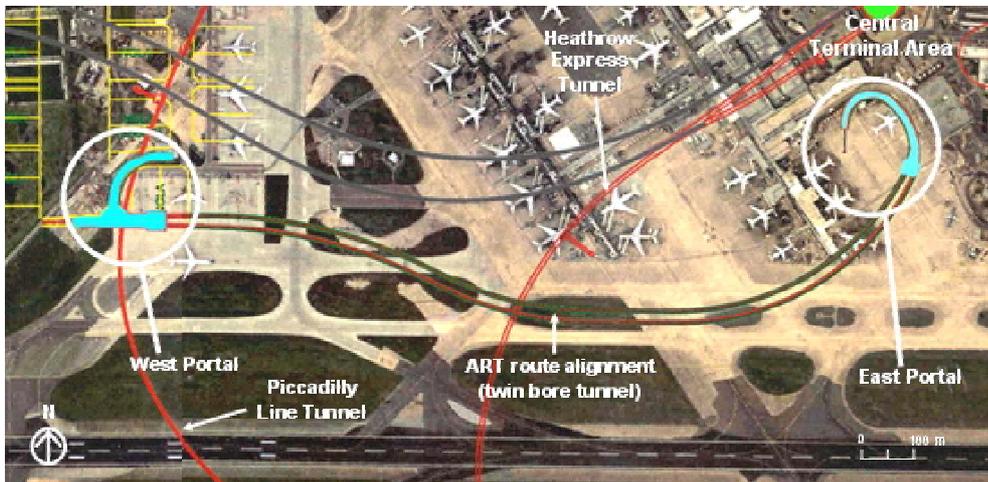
Location plan of the Airside Road Tunnel (ART) at Heathrow Airport
